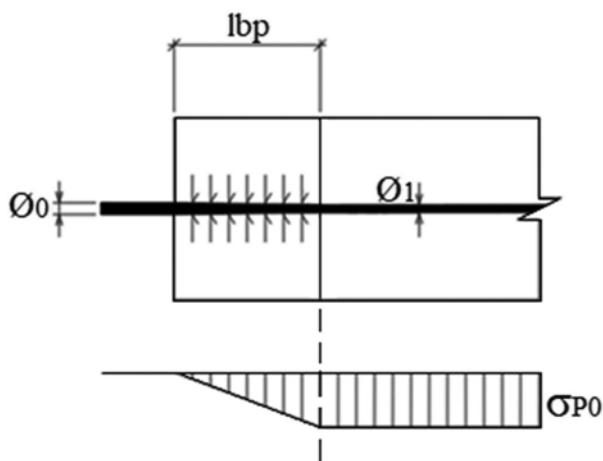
Adherence between steel and concrete in prestressed elements. Adapted from Pfeil (1984).
